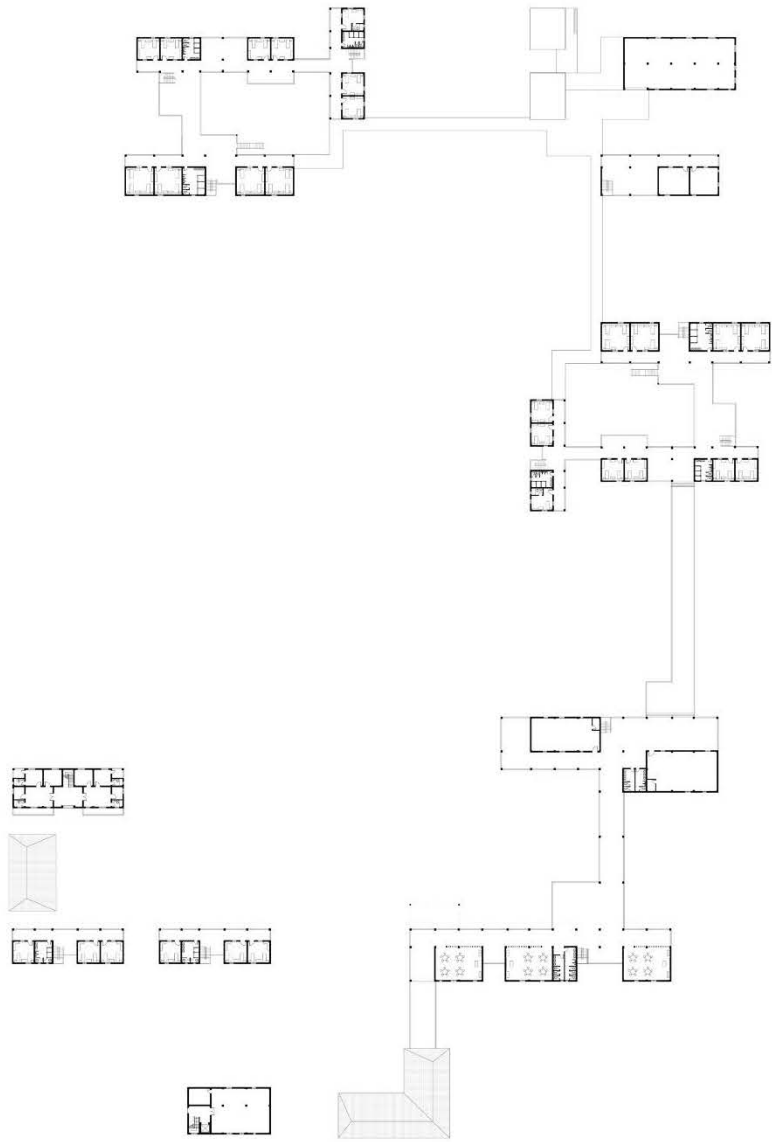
b. First Floor Plan, *not to scale* (Author)
